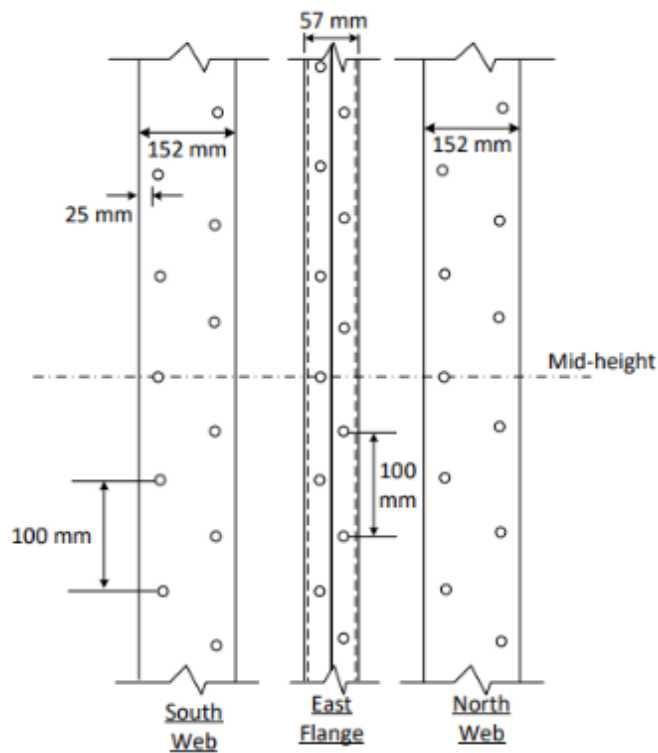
L shaped steel plates and Bolted screw pattern for mullion hardening (Chavan, 2021)
